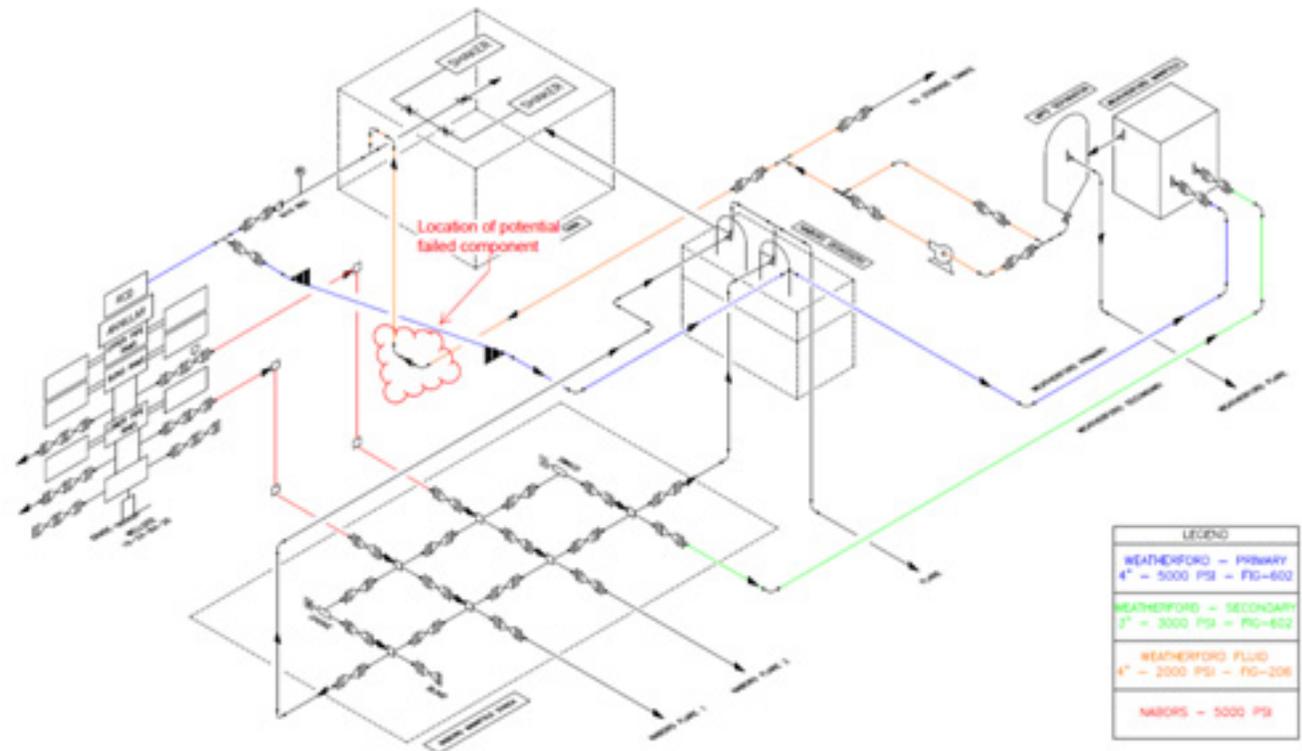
Isometric drawing of the Nabors 9 piping configuration showing the mud return line failure location (not to scale).
